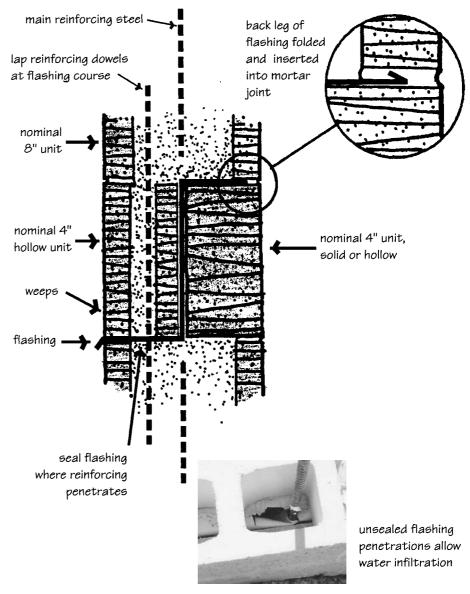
Vertical reinforcing steel is needed in single-wythe walls because flashing disrupts the mortar bond, but penetrations through the flashing must be sealed to prevent water infiltration.
